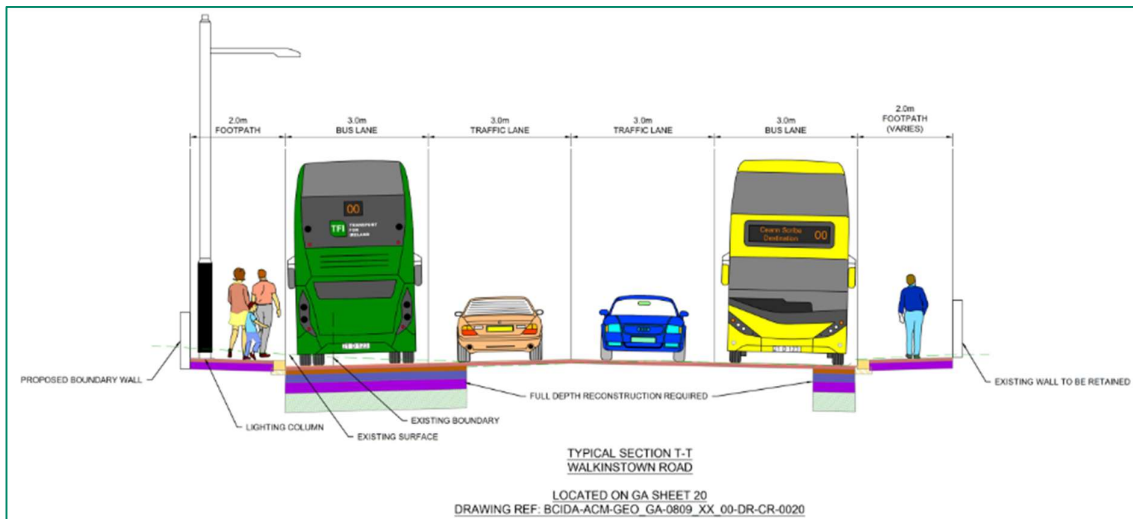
Typical Cross-section adjacent to 140 Walkinstown Road
